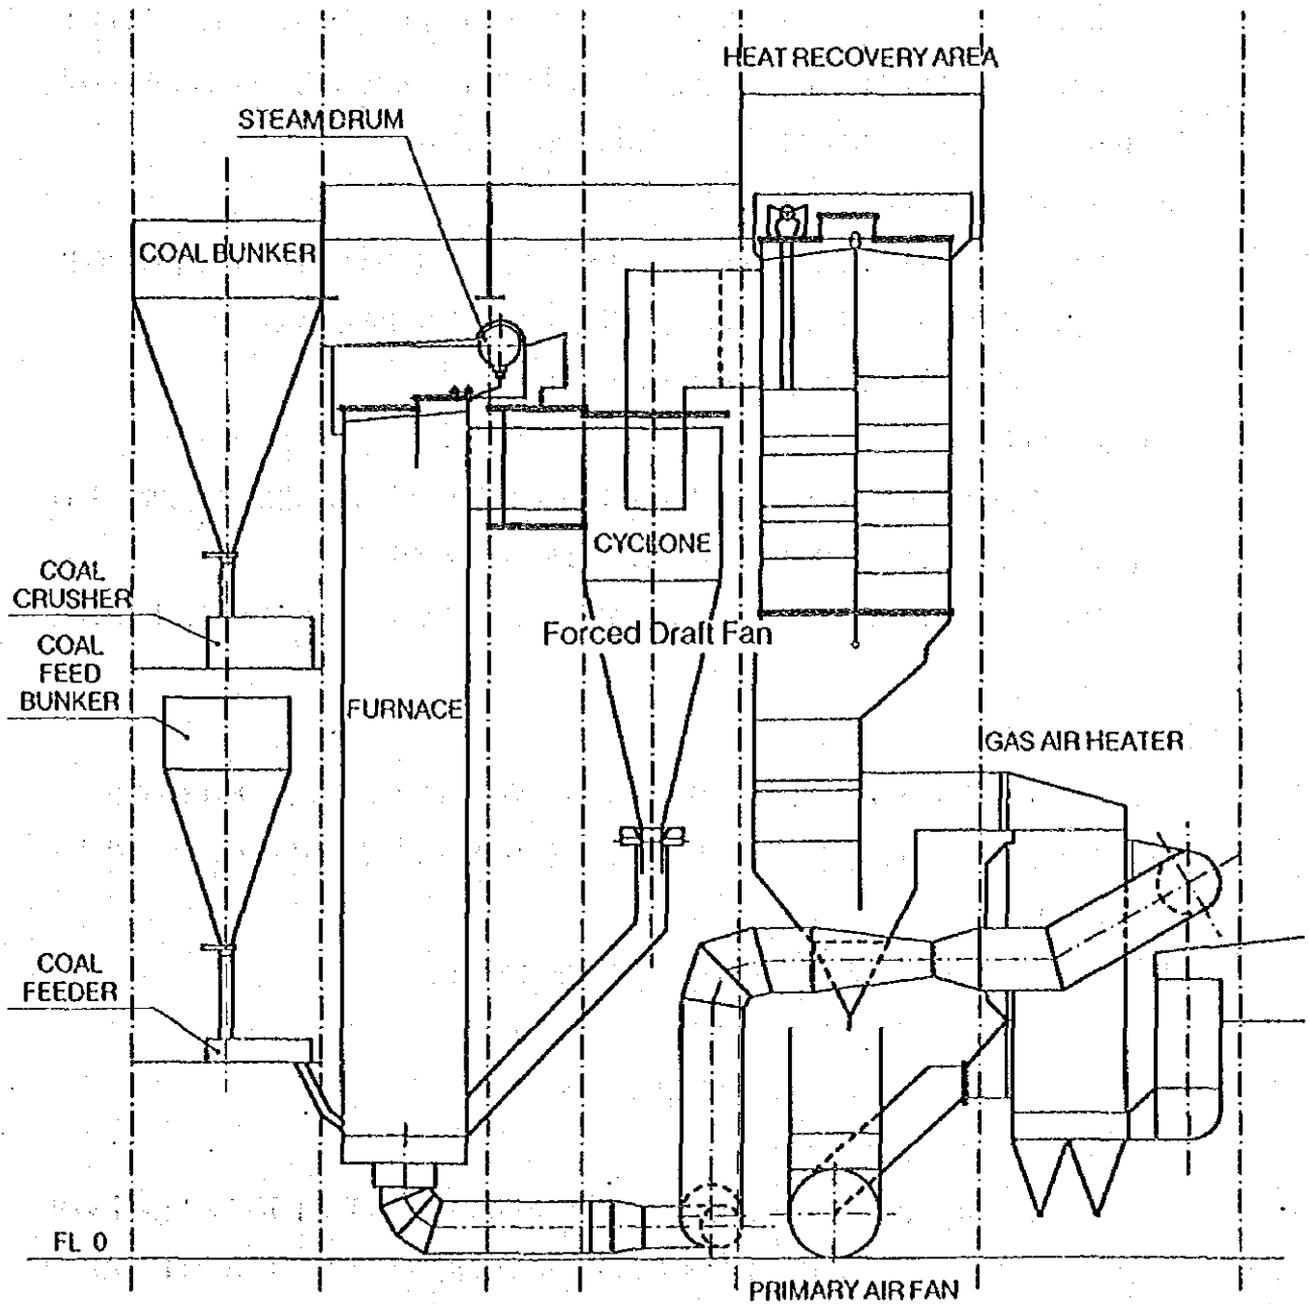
SIDE VIEW OF C-FBC BOILER PLANT
